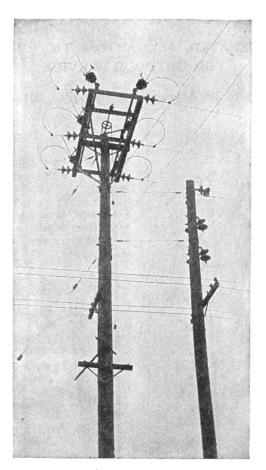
Type T-FC Horn-Gap Switch for 200-Ampere, 44,000-Volt Service. (Closed Position.) Single-Pole, Showing Details of Construction
